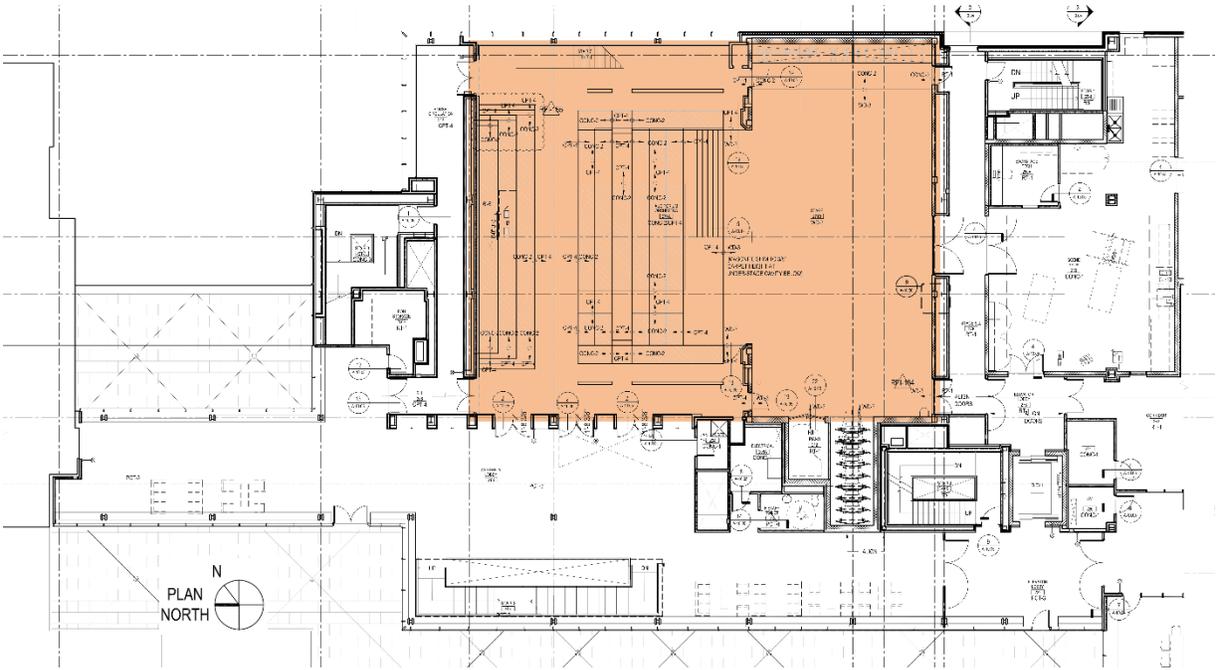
Third Floor "North" Plan – 3 story Theatre
